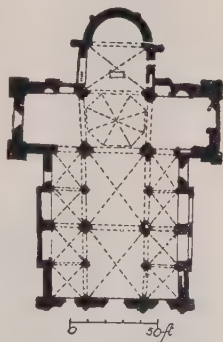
PLAN OF SAN MICHELE, PAVIA.
